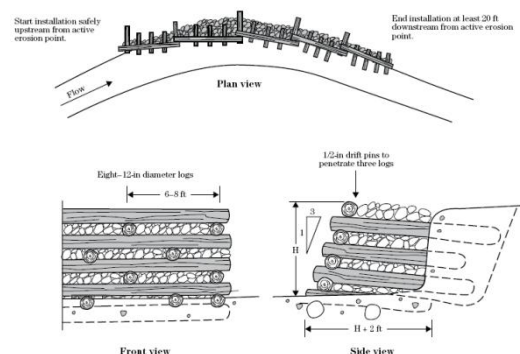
Typical Timber Cribbing Cross-Section and Plan View (National Engineering Handbook, August, 2007).
